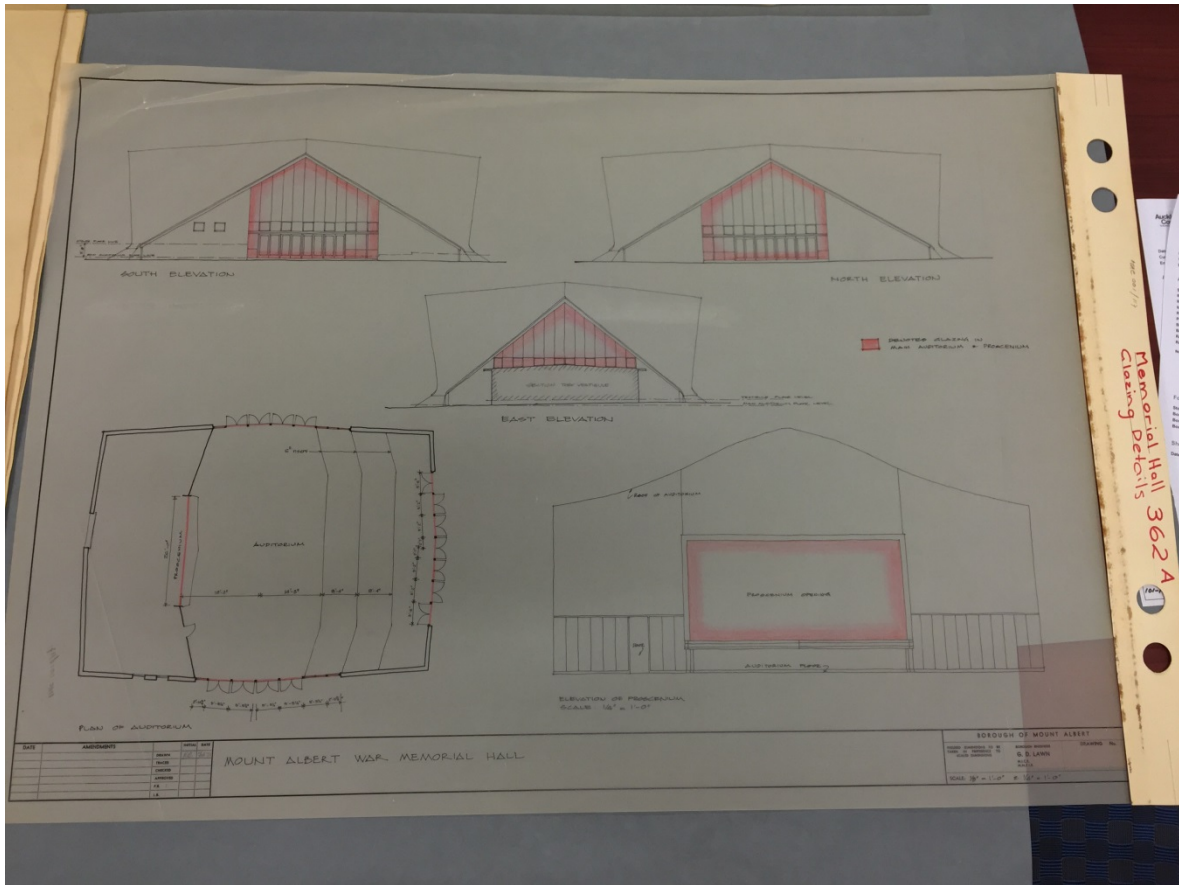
Drawings of the elevations and plan of auditorium of the main hall building of Mt. Albert War Memorial Hall. MAC001-111-120 Auckland Council Archives, February 1971.
